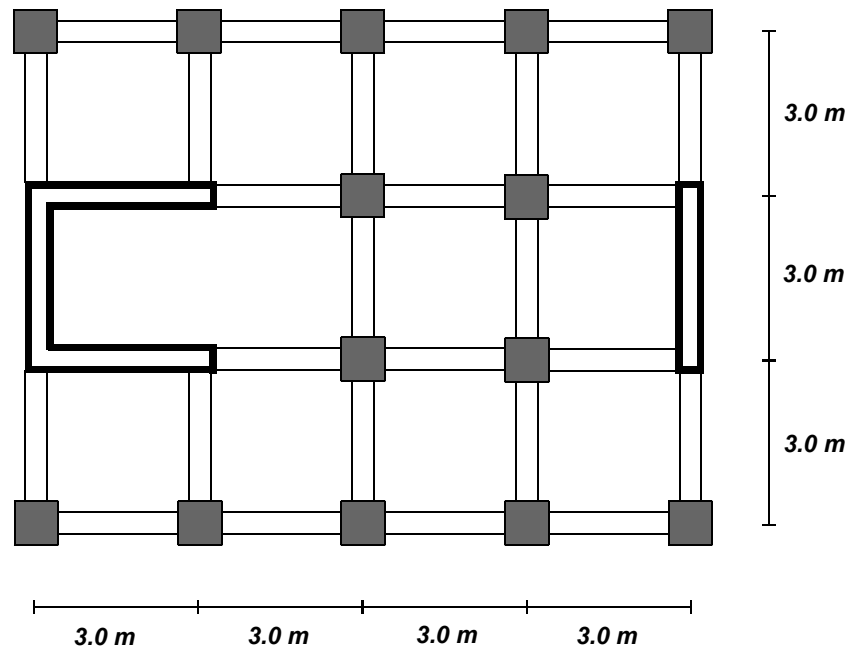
Typical Floor Plan of a Shear Wall - Frame Building Structure
